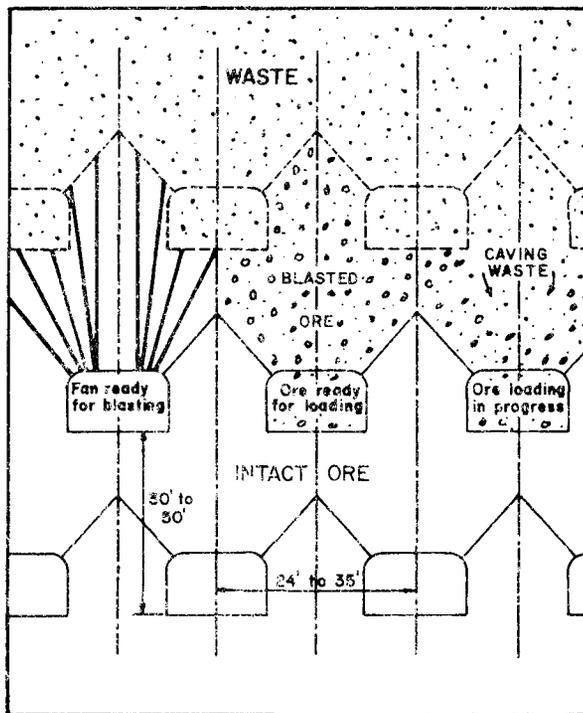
Cross Section of a Typical Sublevel Caving Operation--from Haycocks (1973)
